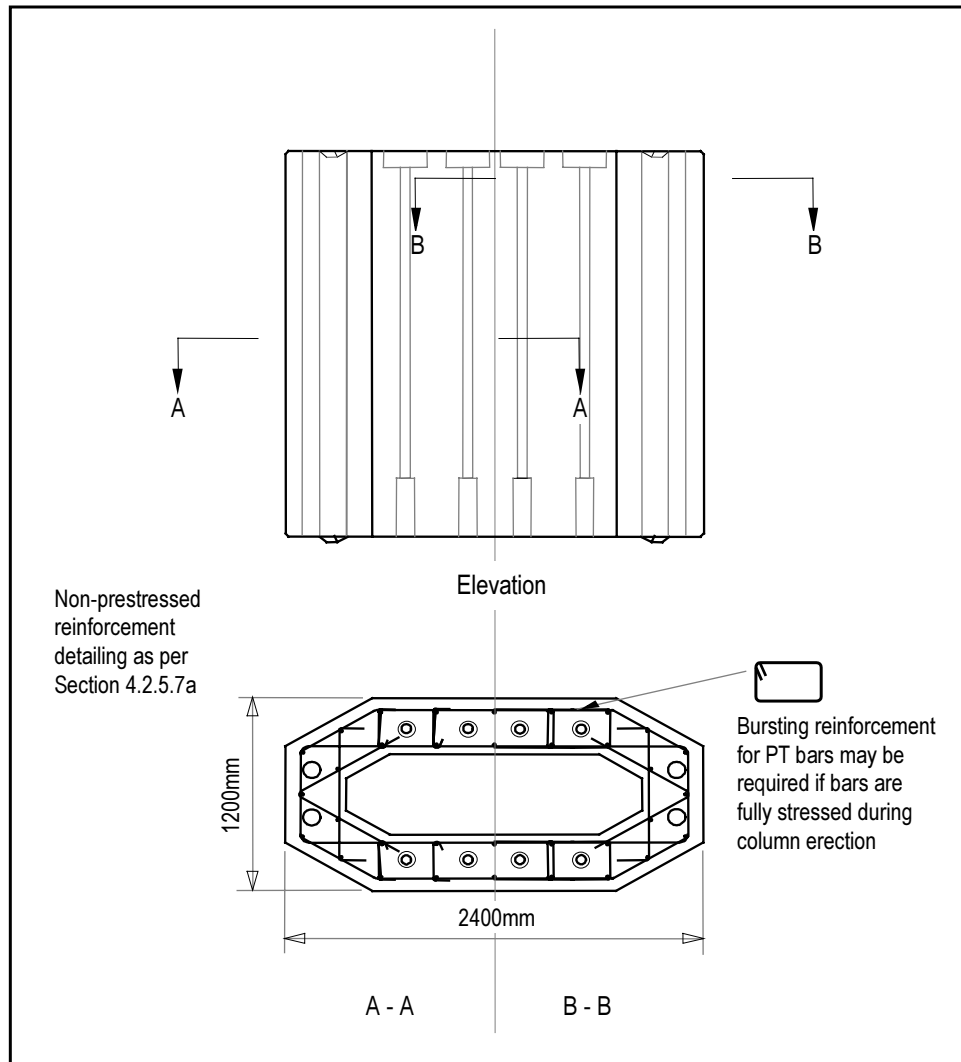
A typical 2.4 m (8 ft.) P24 segment
